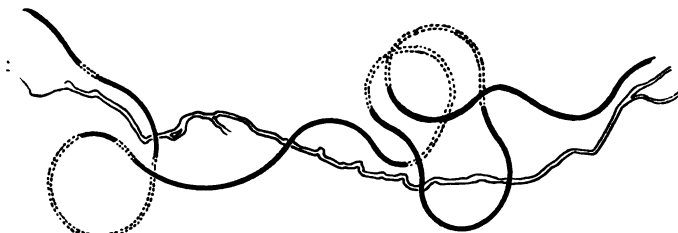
Sketch plan of three helicoidal tunnels on the Albula Railway, Switzerland. The tunnels are indicated by dotted lines.
